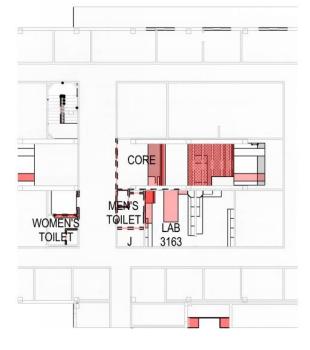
Phasing Diagram Demo Floor Plan, Level 3
